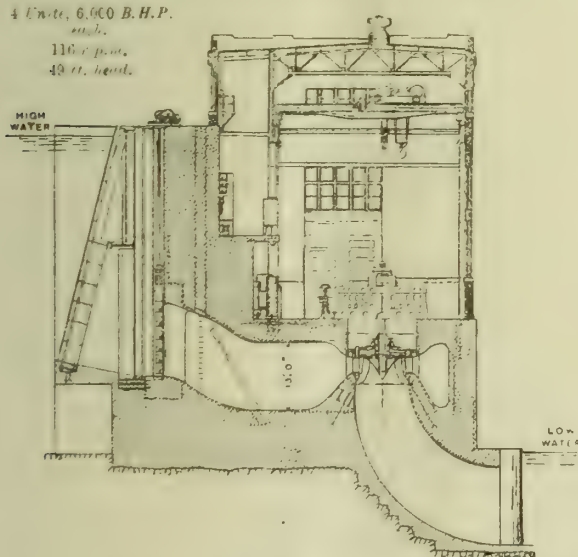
Cross Section of Power House, Appalachian Power Co., New River, U.S.A.
